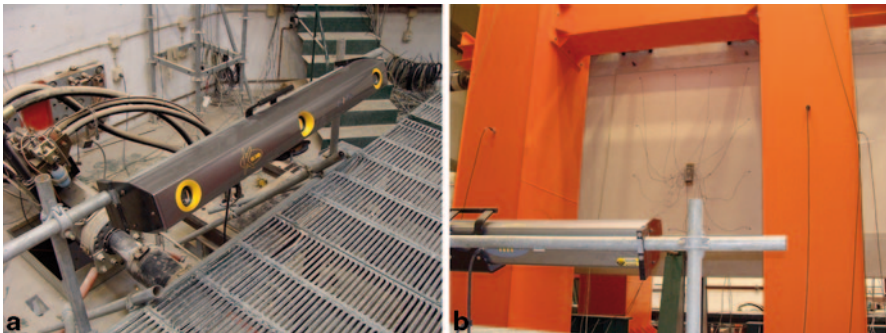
Out-of-plane wall panel deformation measurement system. (Krypton 2003)
